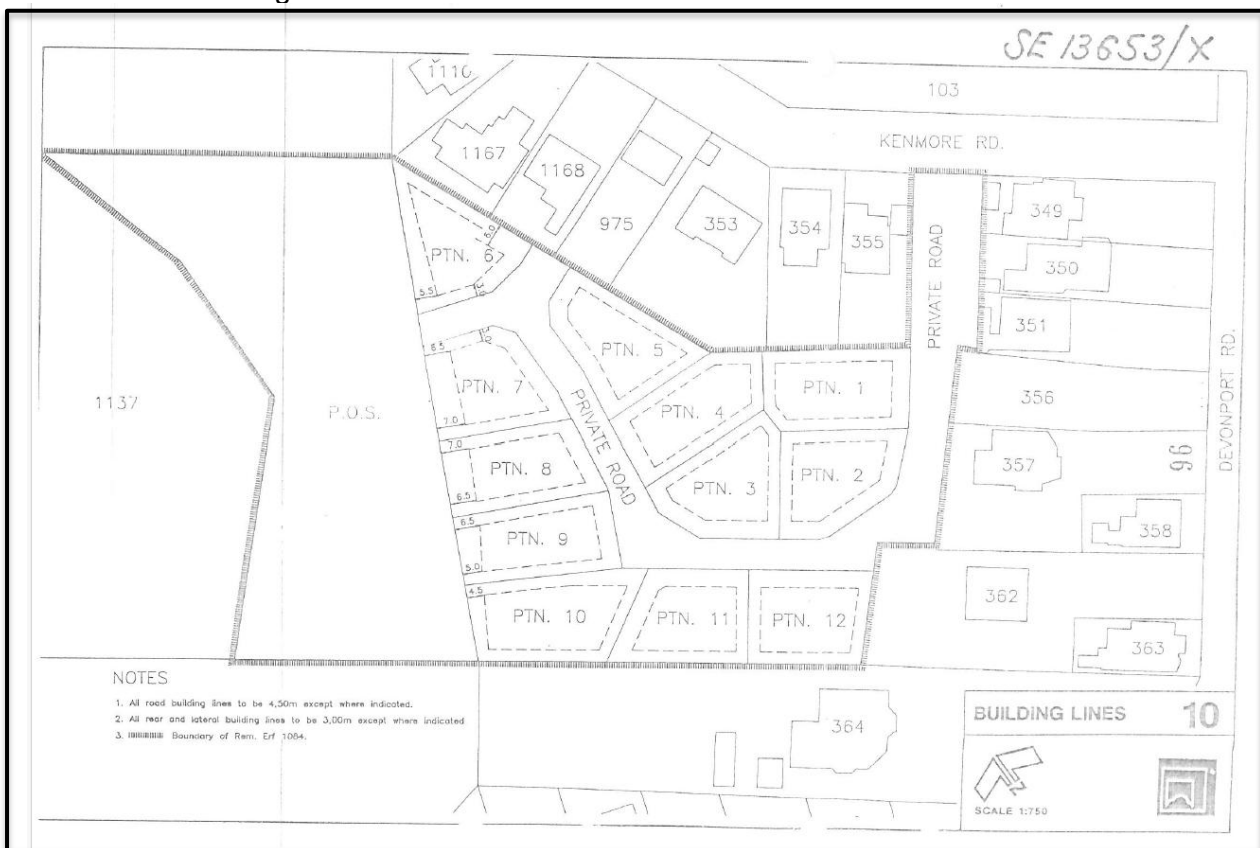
1993 subdivision building line setbacks defining permitted building footprints
